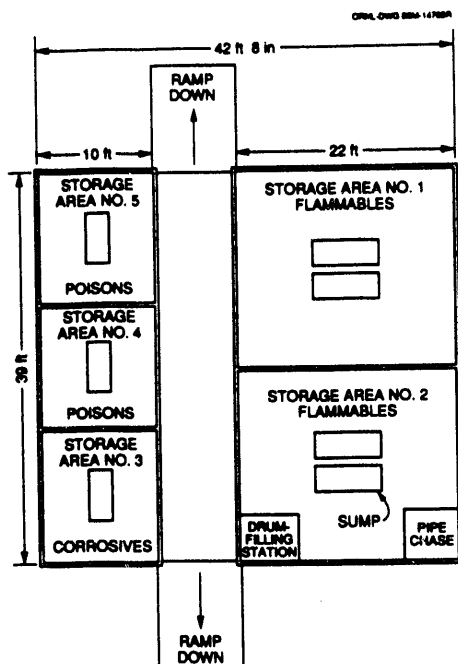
Layout of the Long-Term Hazardous Waste Storage Facility (Building 7654).
